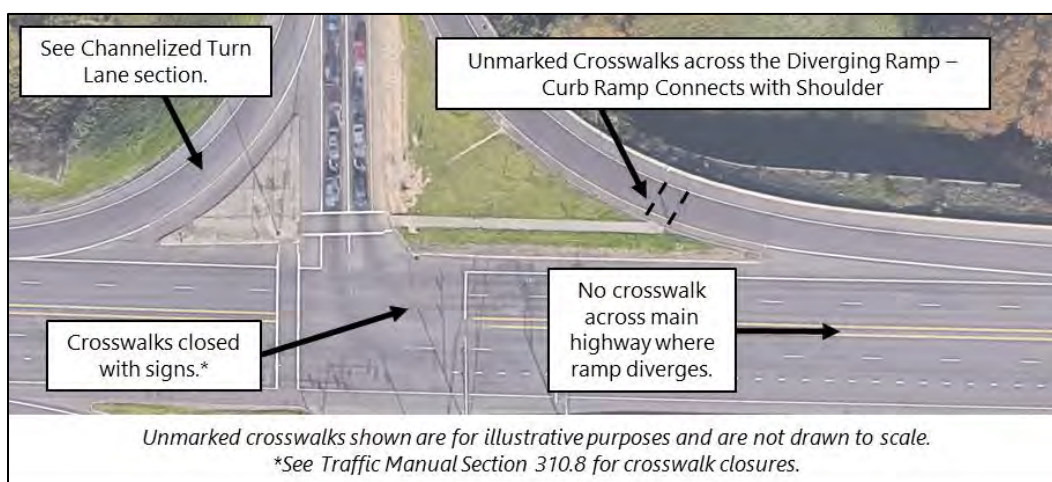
Unmarked Crosswalk Connecting Curb Ramp and Shoulder across a Diverging Ramp
